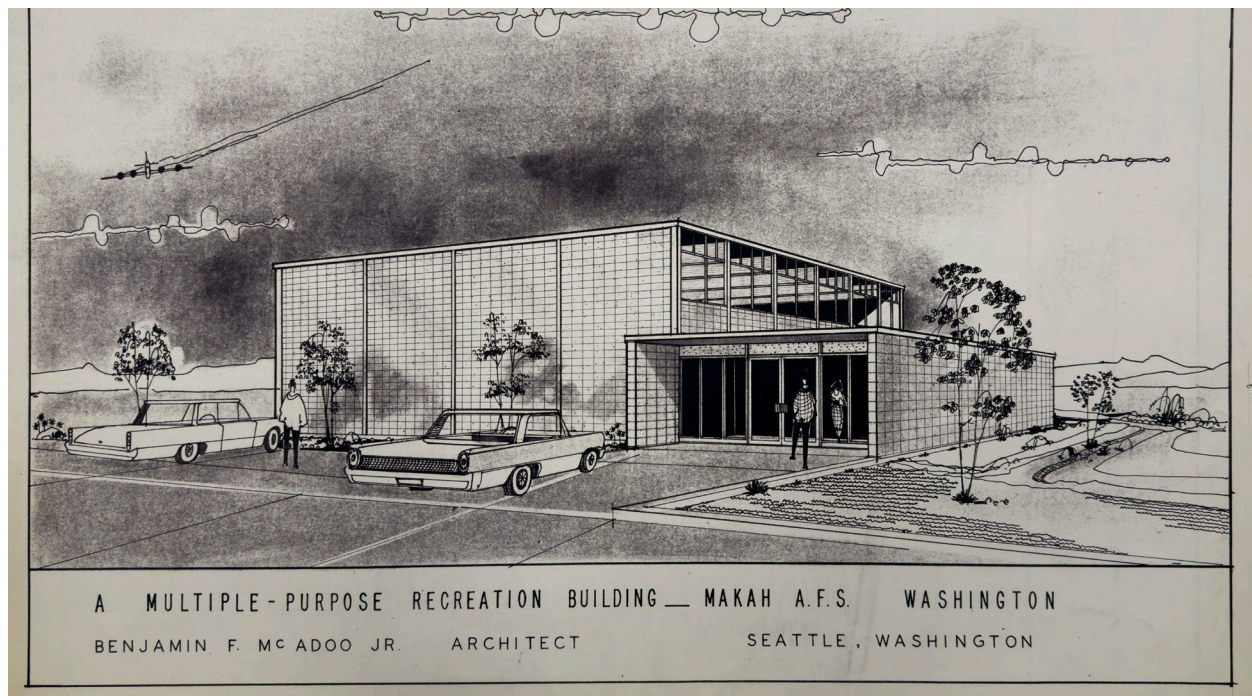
Rendering for a multi-purpose recreation building for the Makah Air Force Station, Neah Bay, undated.
